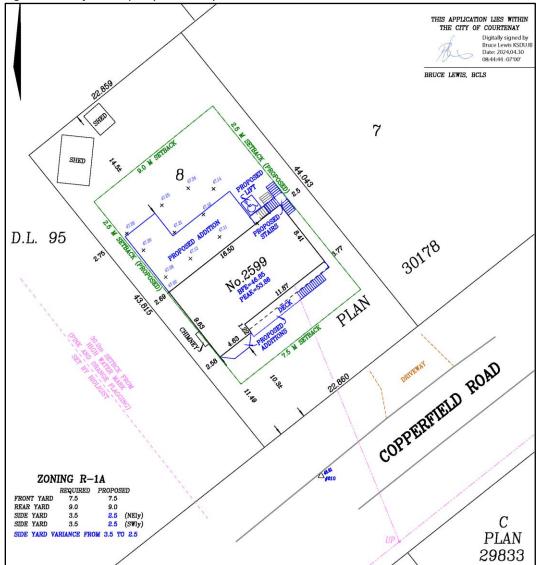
Subject Property with Proposed Addition, External Stairs & Setbacks
